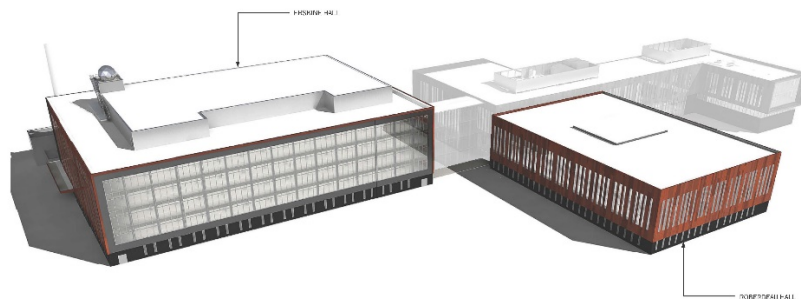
Rendering of proposed Erskine and Roberdeau Hall facades
